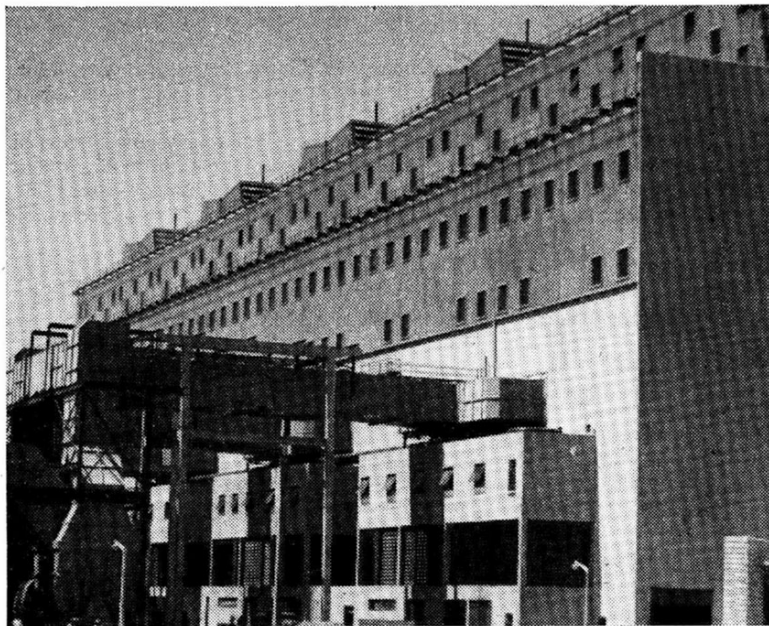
EAST ELEVATION OF THE BOILERHOUSE
